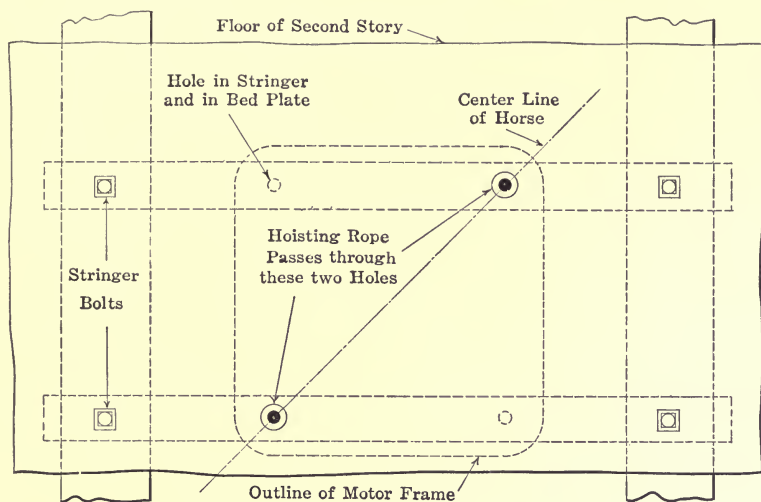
PLAN VIEW ON SECOND FLOOR.
